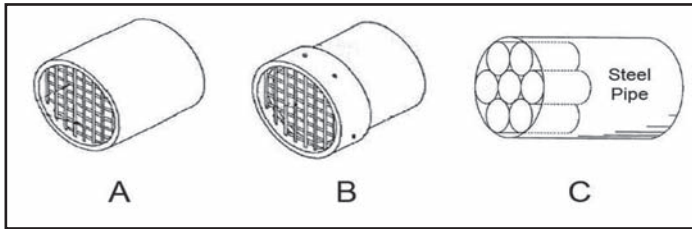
Culvert grill examples. A: Steel culvert grill; B: Concrete culvert grill; C: Large culvert with short honeycomb pipes. (MIL-HDBK-1013/10)
